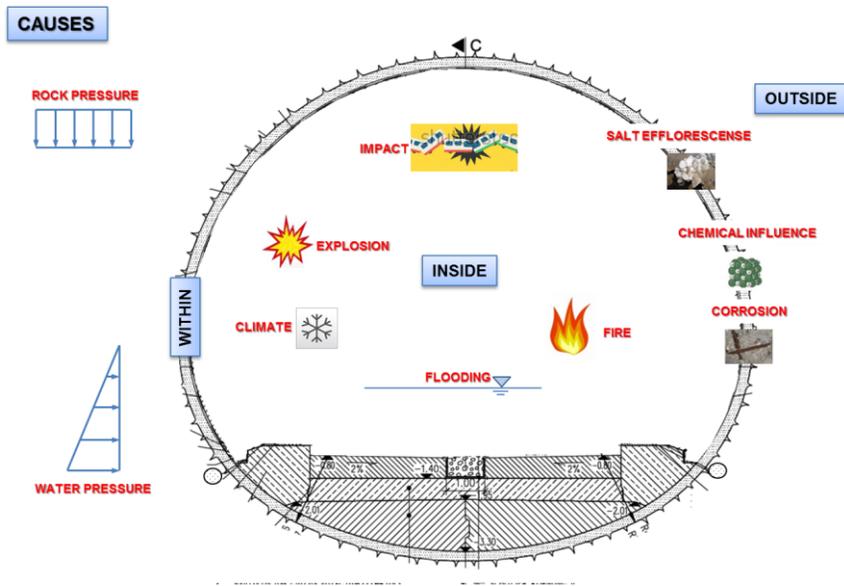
Causes on tunnel strengthening (shotcrete)
